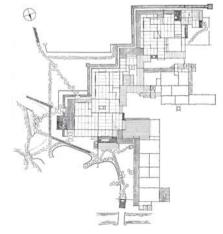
The additive jointing principle of the rooms Katsura Imperial Villa
